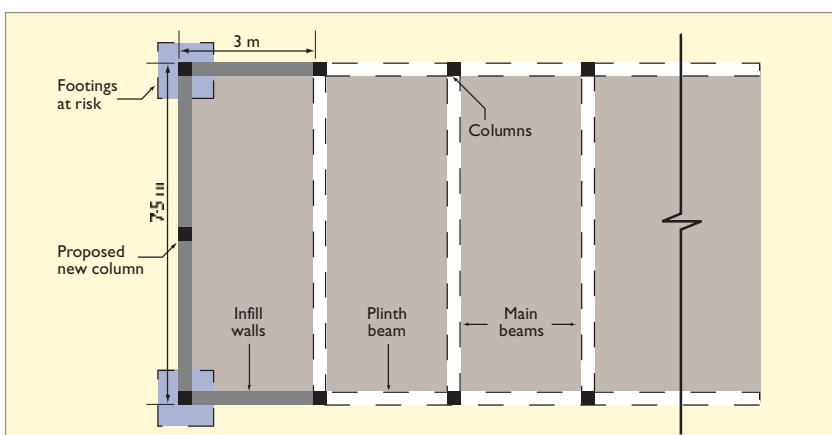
Example of improving redundancy and robustness against foundation undermining, with corner infill walls, ground beams and additional end columns
